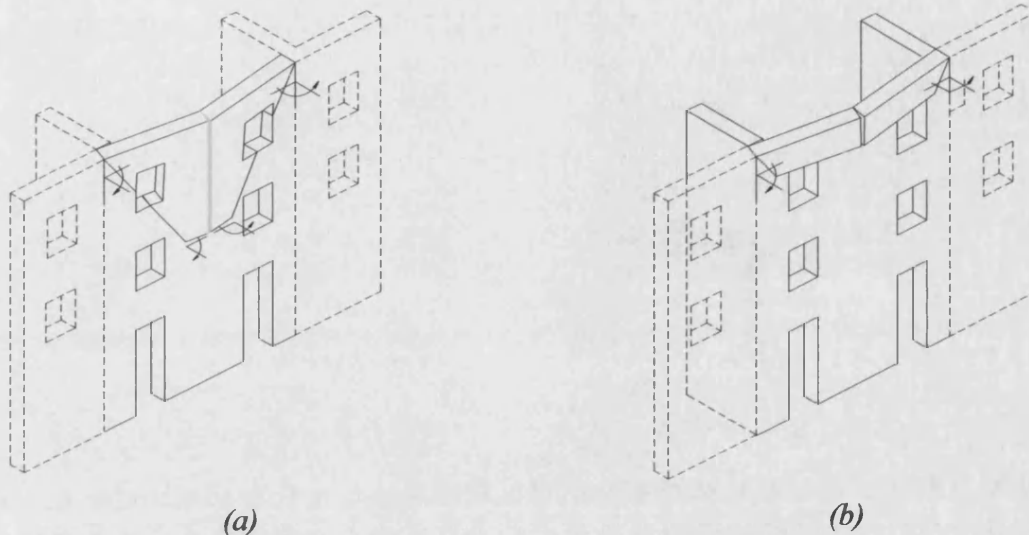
47- Horizontal strip arch failure (a - failure mechanism G; b – failure mechanism Gs)
